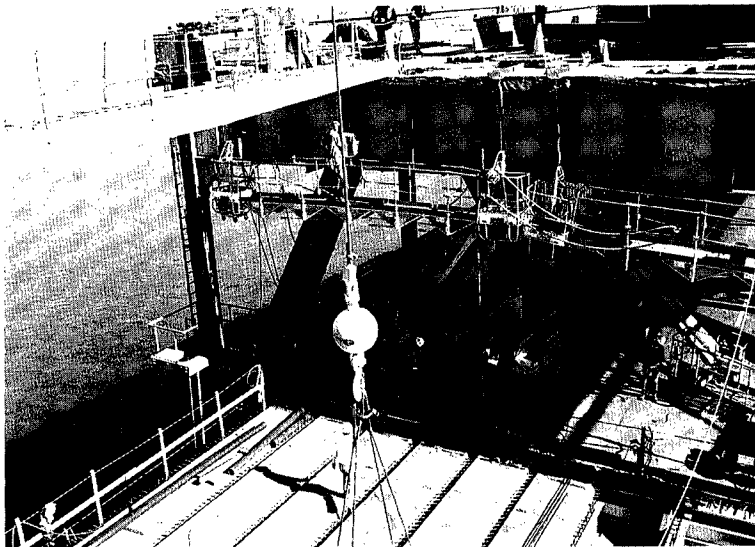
Repair works on Pier E9 of Bay Bridge (photographed on 11/7/89).
